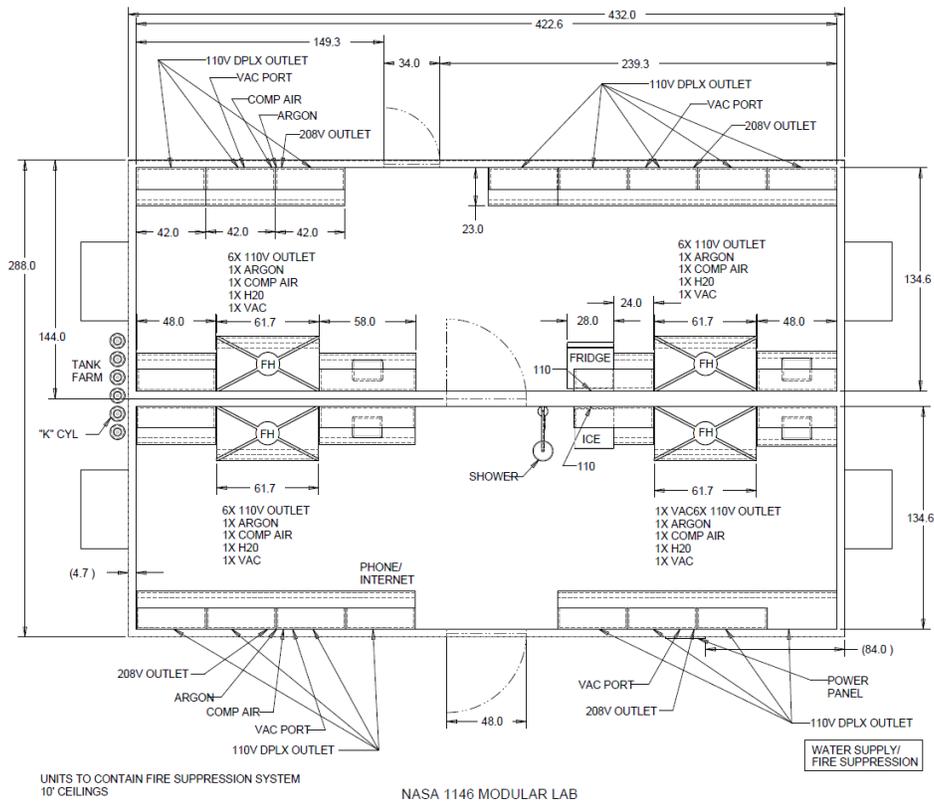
General laboratory schematic detailing location of 120V and 208V electrical outlets, fume hoods, sinks, safety shower, refrigerator, ice maker, doors, case work, inert gas and vacuum ports, HVAC units, and building structural dimensions. Location of phone/internet jack, power panel and water supply for fire suppression system also indicated. Note: external drain is located at water supply position.
